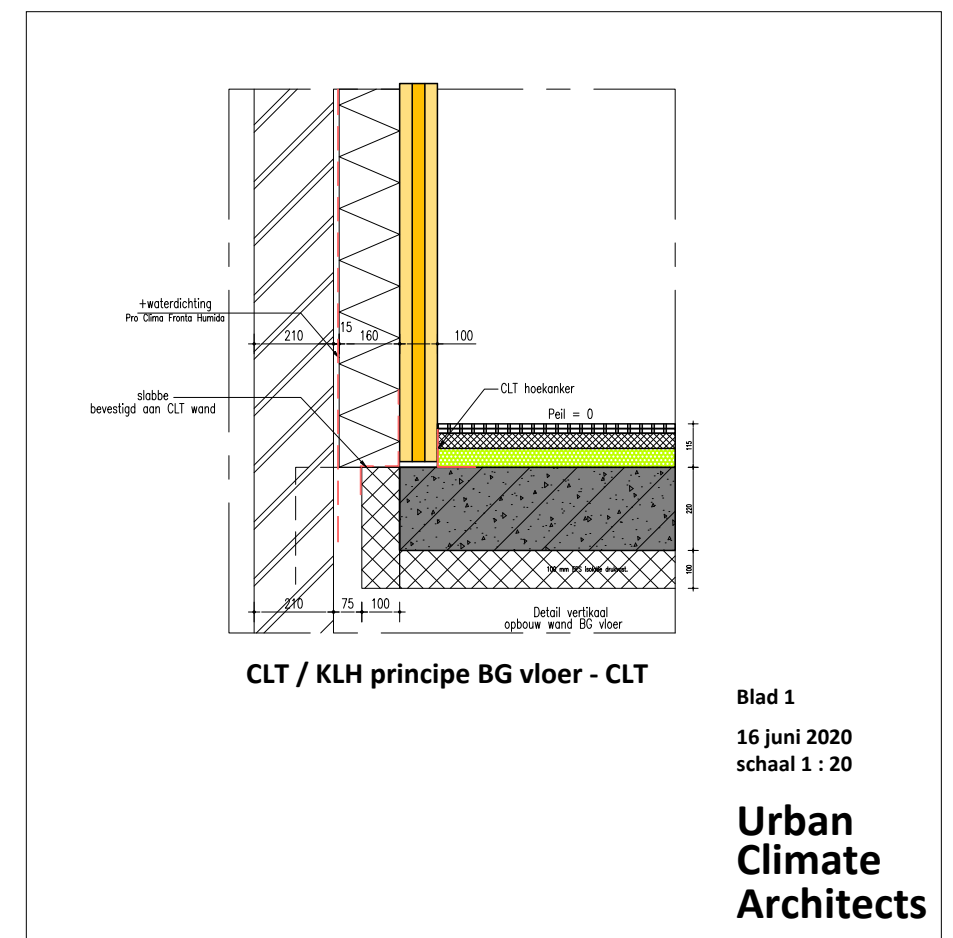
Connecting prefabricated external CLT wall to concrete slab.
